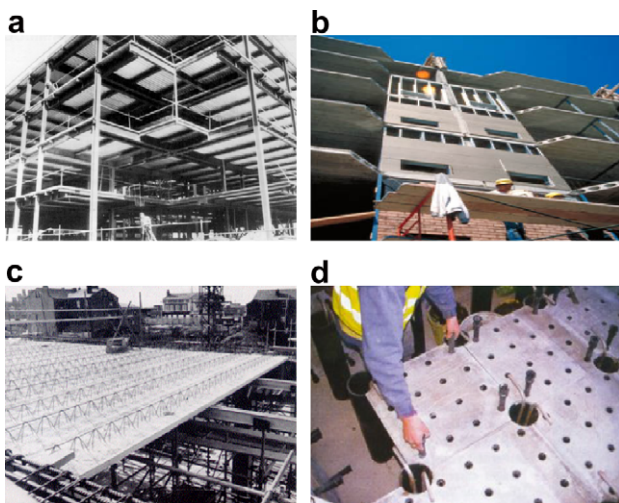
Existing permanent formwork systems: (a) steel decking, (b) precast concrete hollow slabs, (c) pre-cast (truss-plank), (d) GFRC.
